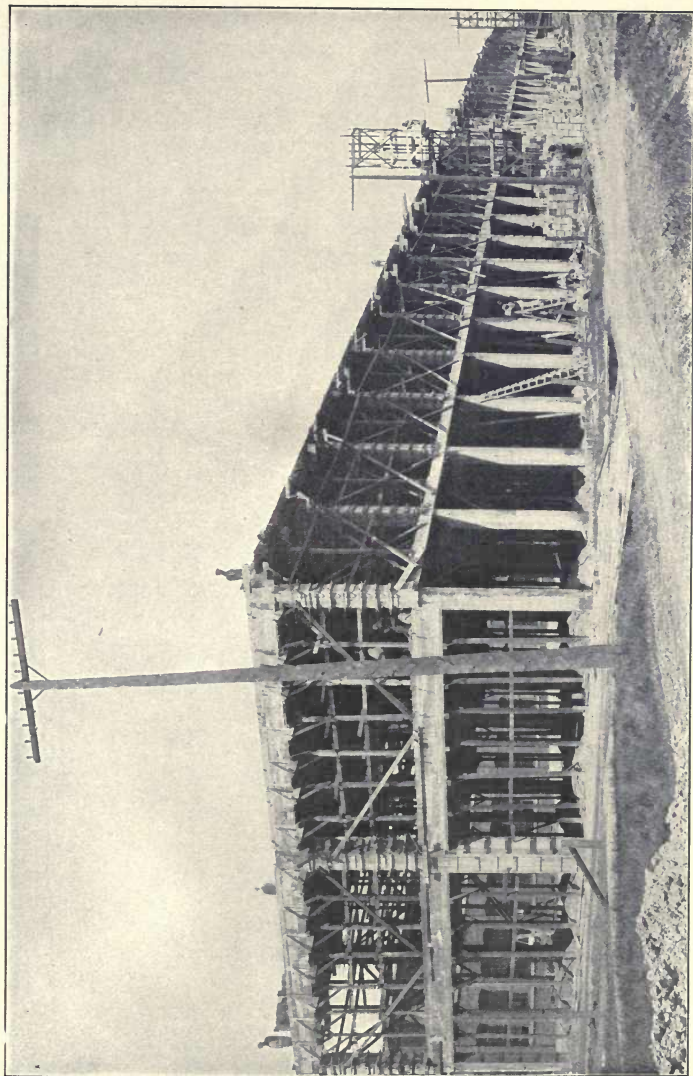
Exterior View of Packard Factory Under Construction, Showing Second Floor Centering in Place. (See p. 142.)
